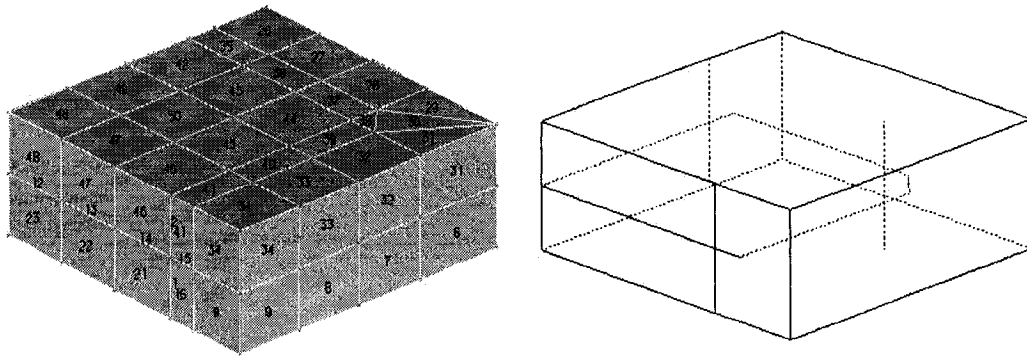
Finite Elements and Reinforcement Location of Section Models
